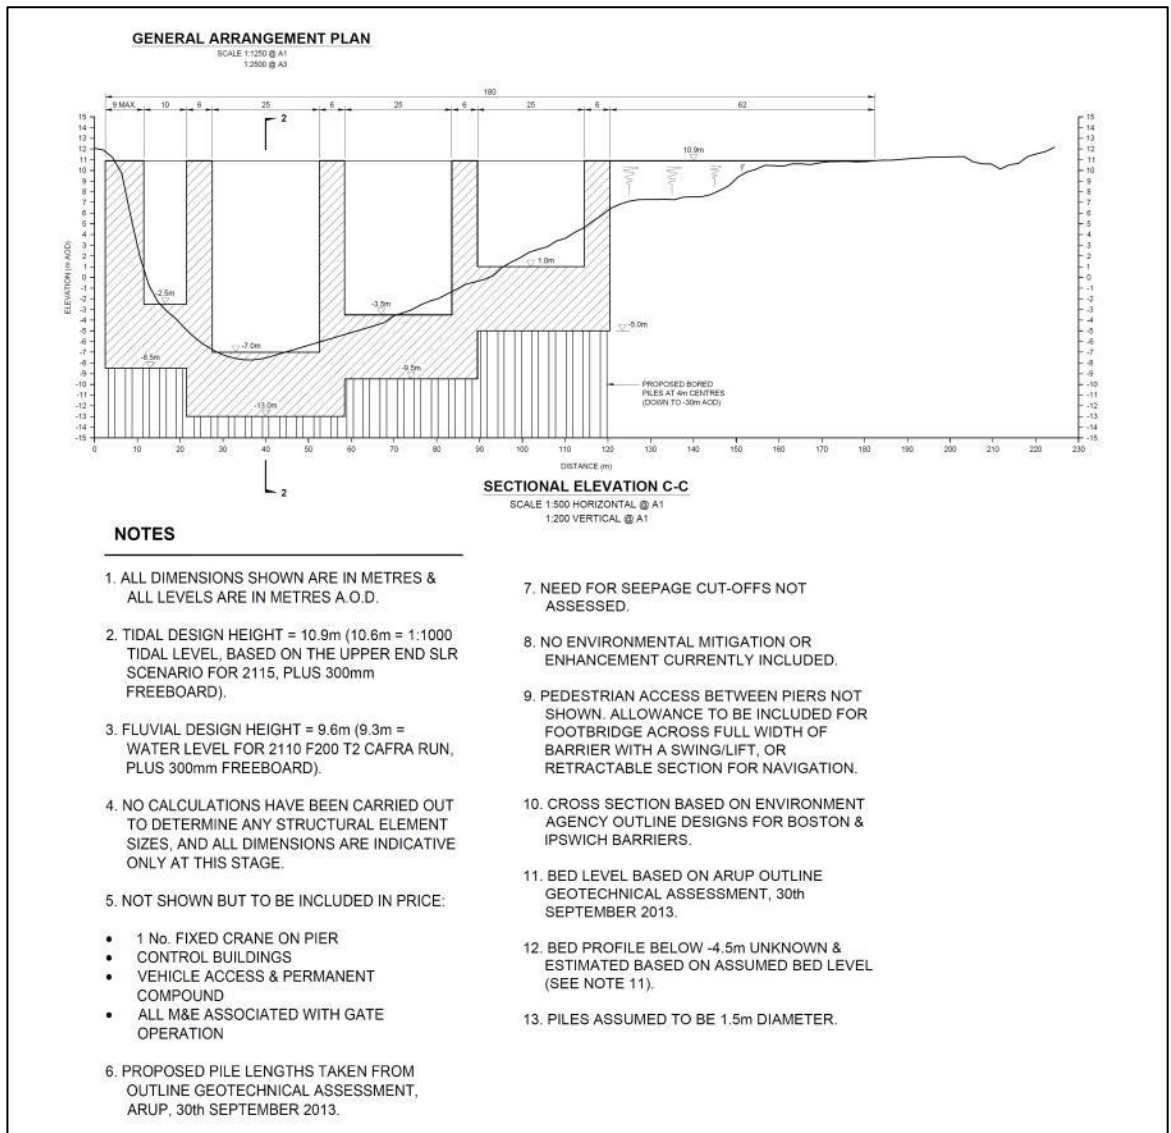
Indicative cross section for a Narrow Barrier at Ham Green-Nibley Road
